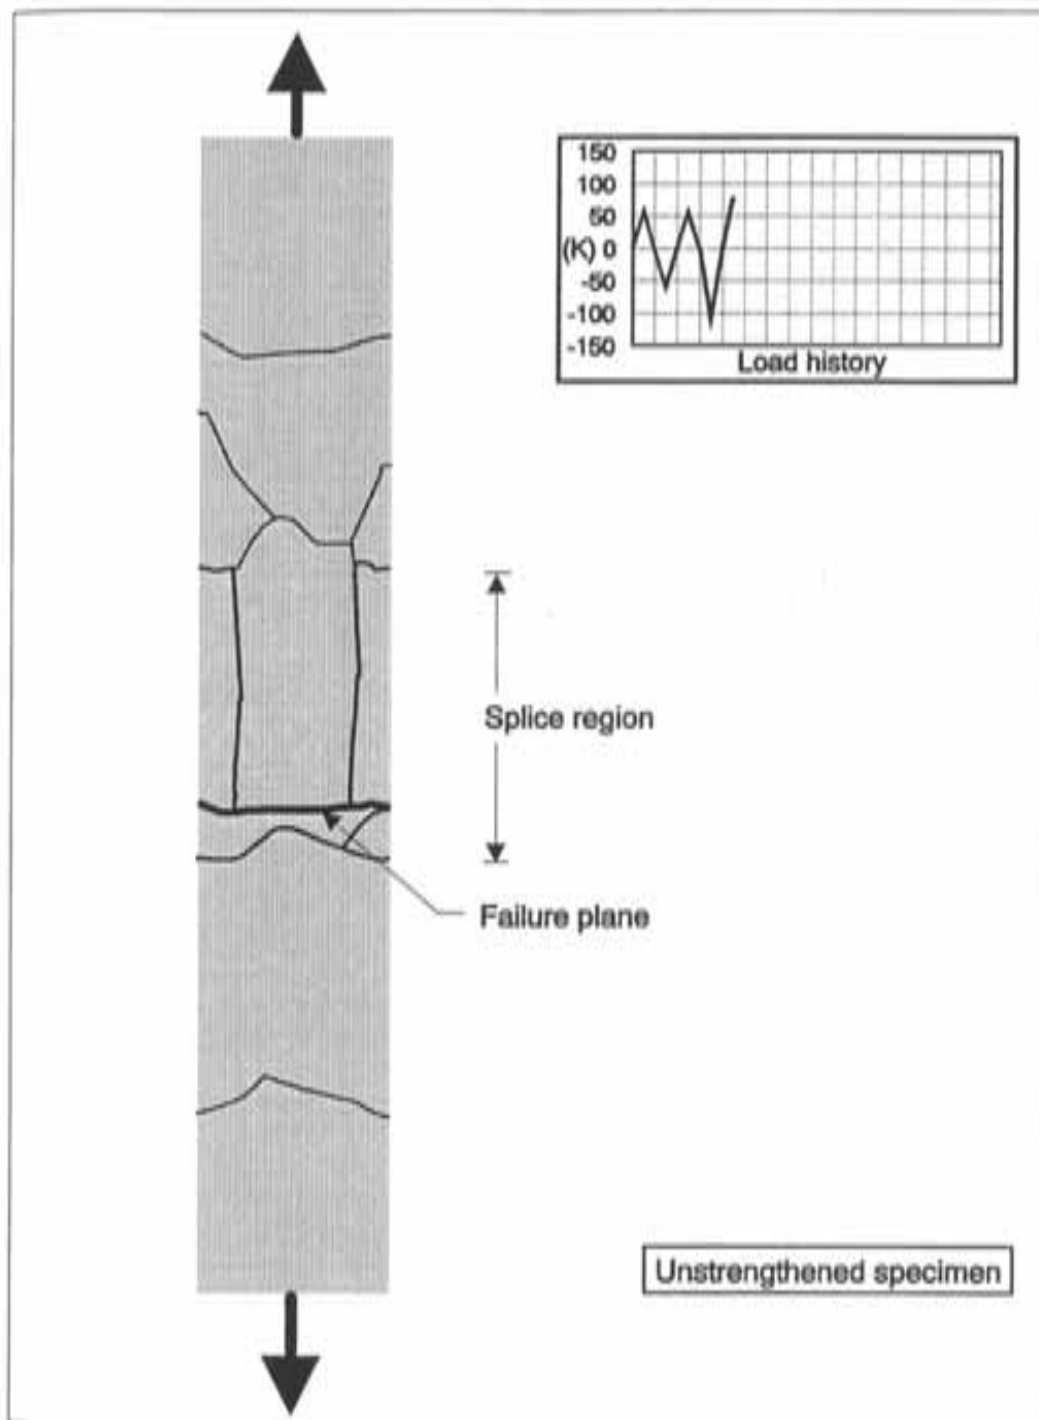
Crack pattern in specimen U-B-1 at failure
